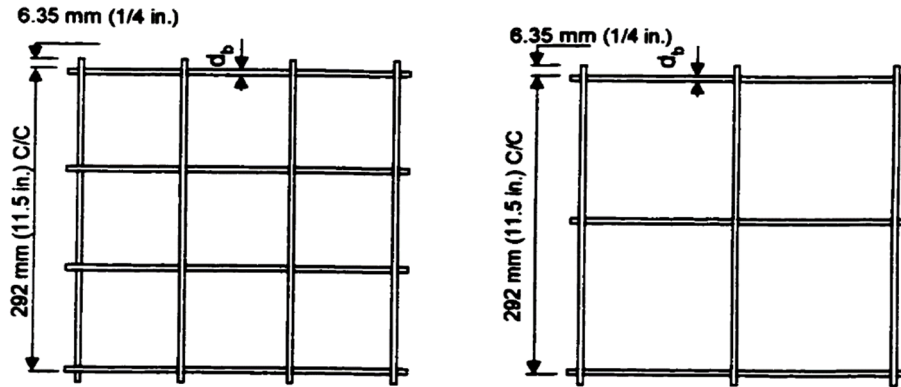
Geometric Details of Welded Wire Reinforcement Grids (Grira 1998)
